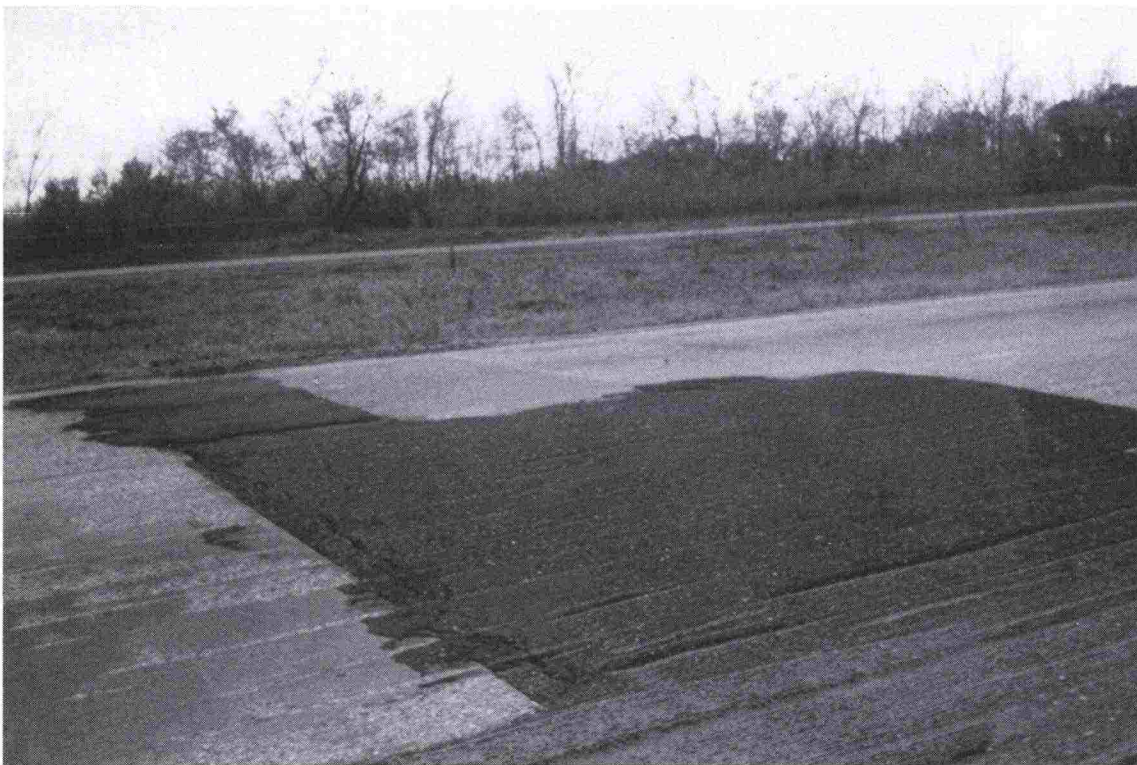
A bump at the culvert, a failed temporary repair, Minnesota
